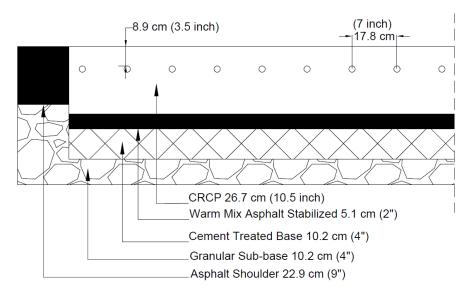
Cross section of sections 1C, 1D, and 1E with 2-inch warm mix asphalt over 4-inch cement treated base. The same base type is also used for sections 2A and 2B.
